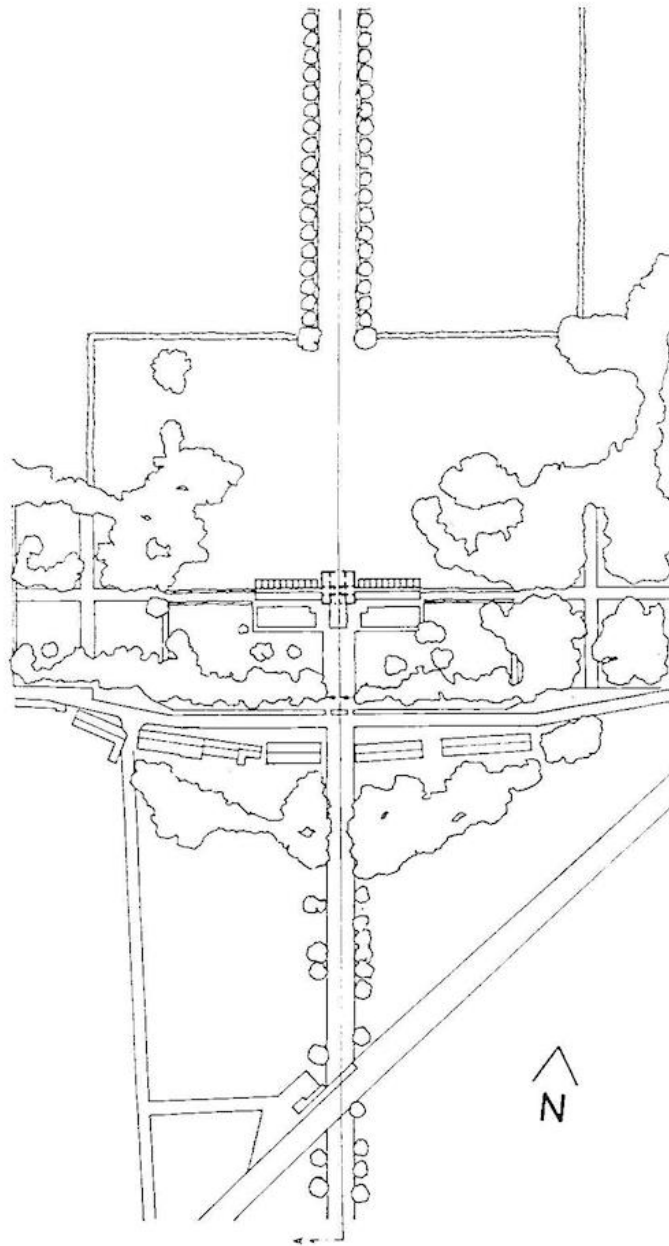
Villa Emo, layout plan (Steenbbergen and Rech, 1996)
